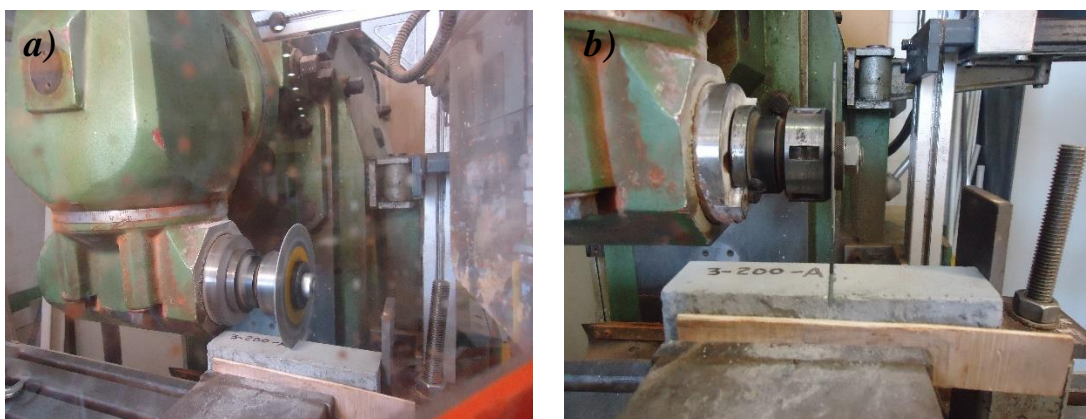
Notching: a) dry sawing starting the notch and b) notch in the centre of the specimen.
